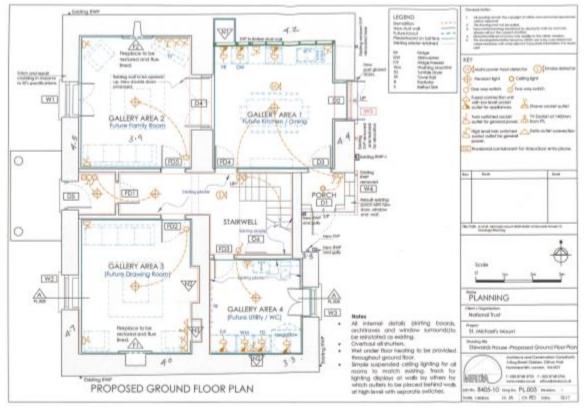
Architect plan showing the ground floor rooms of Stewards House, as supplied by the client. The room numbers were subsequently altered.
